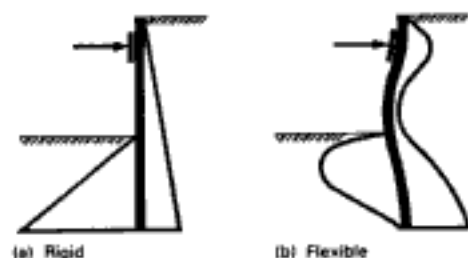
Influence of wall flexibility on pressure distribution: (a) rigid wall; (b) flexible wall (Padfield and Mair⁶)
